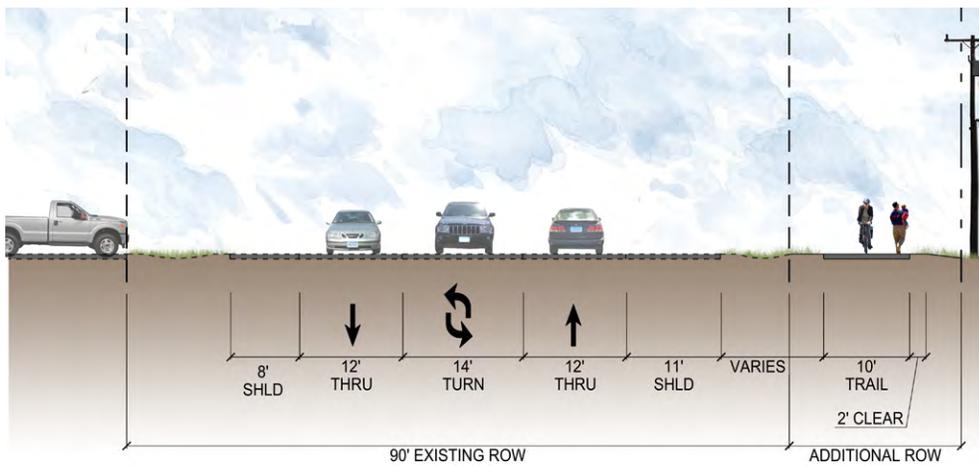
Typical Section for the Proposed Trail along CR 14 East of Lake Elmo Avenue
